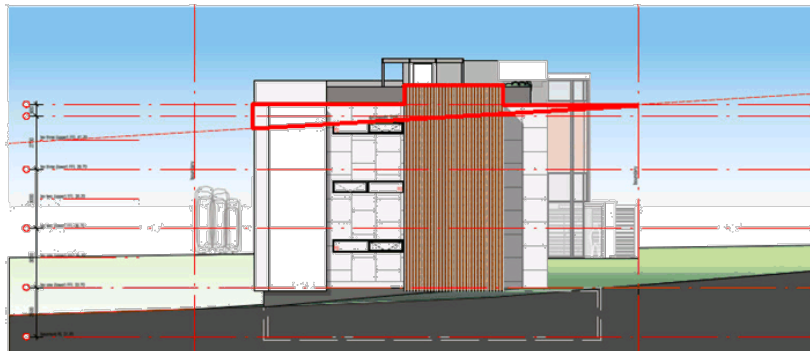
Plan extract of western façade showing 9m height breach (in red).
